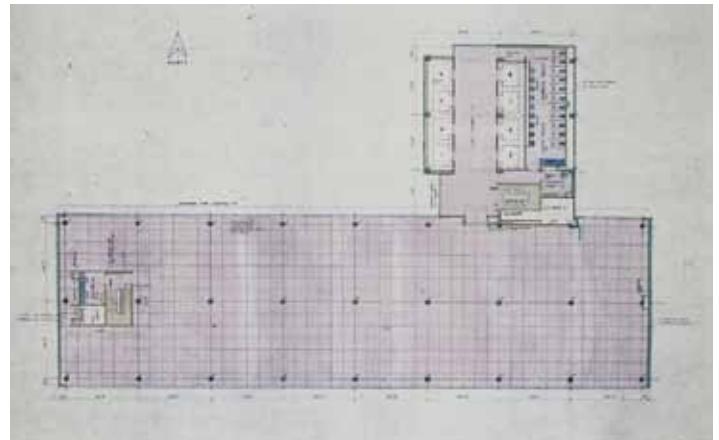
Bates, Smart & McCutcheon, ICI House, typical floor plan, dated 19 June 1956, PROV, VPRS 11200/P0001, Unit 1718, Building Application no. 30056, Sheet no. P329, amendment C, 4 October 1956.
